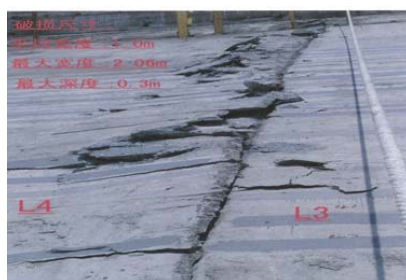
Tianshengqiao 1 concrete spalling along Center slabs L3 and L4 (2003)
